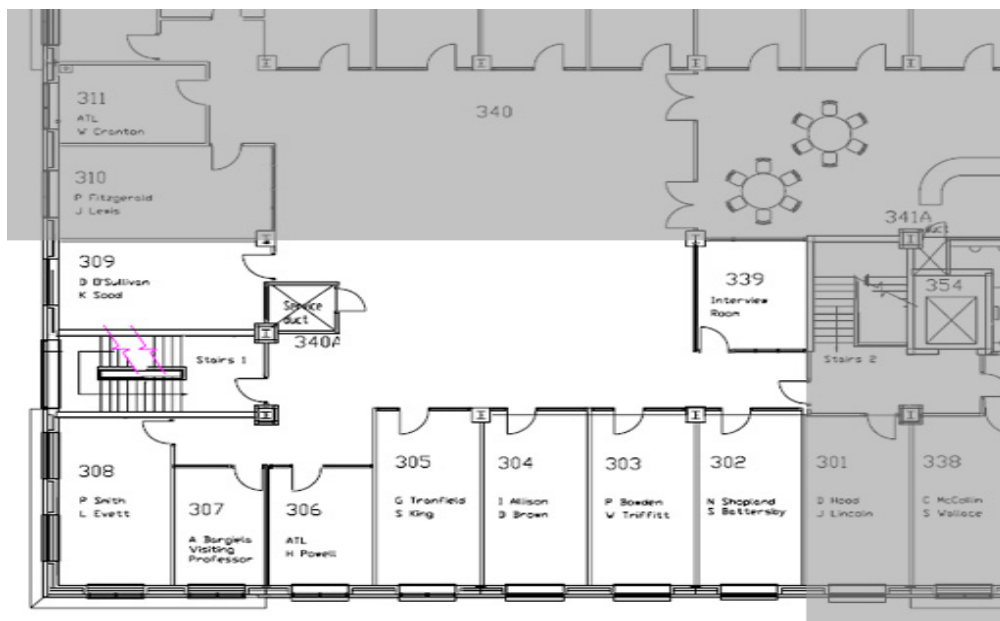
Floor plan – only the shaded section was used for navigation in the present evaluation.
